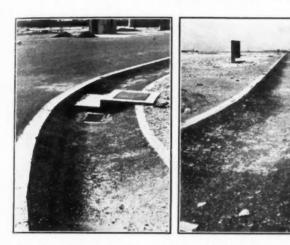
Open type surface water drain showing long run and typical outlet.
